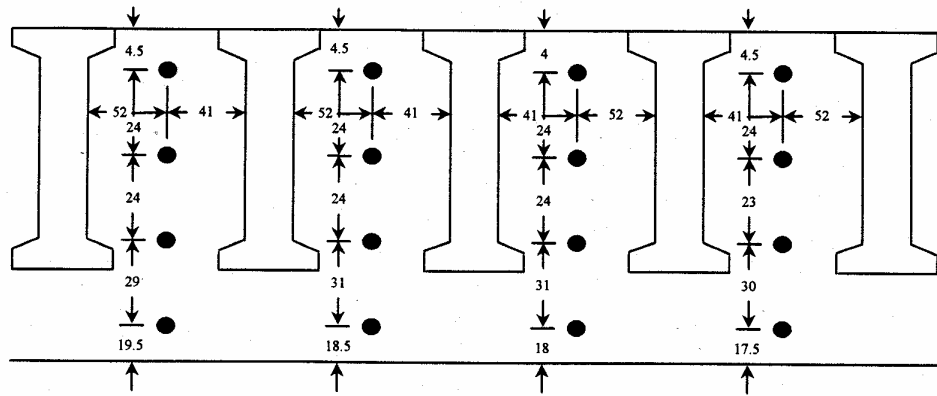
a. White River Bridge north abutment gap measurement hole locations in Relation to the abutment and bridge beams
